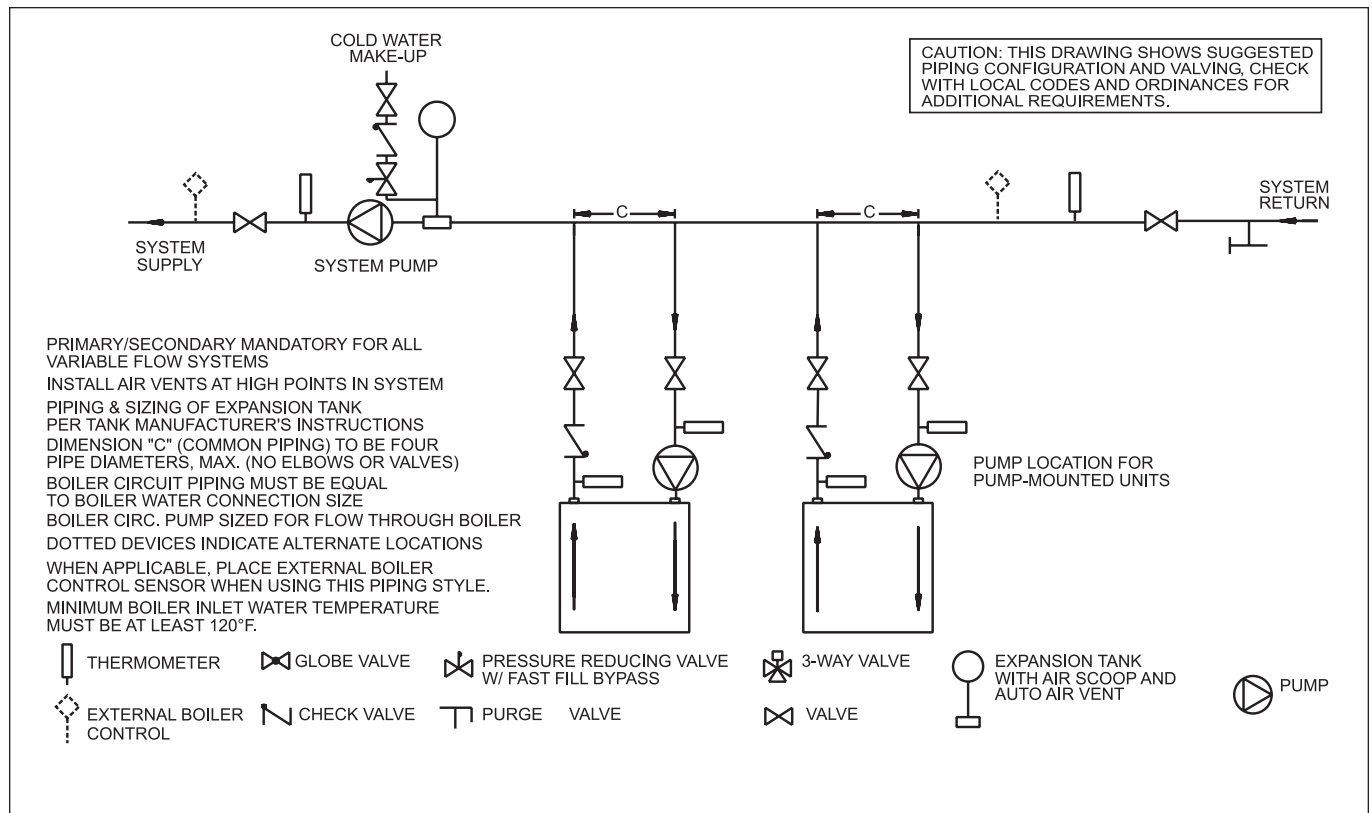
Hydronic Piping — Multiple Boilers, Primary Secondary System.
